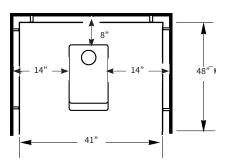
Alcove stove clearance with Double-wall pipe and wall protection.
